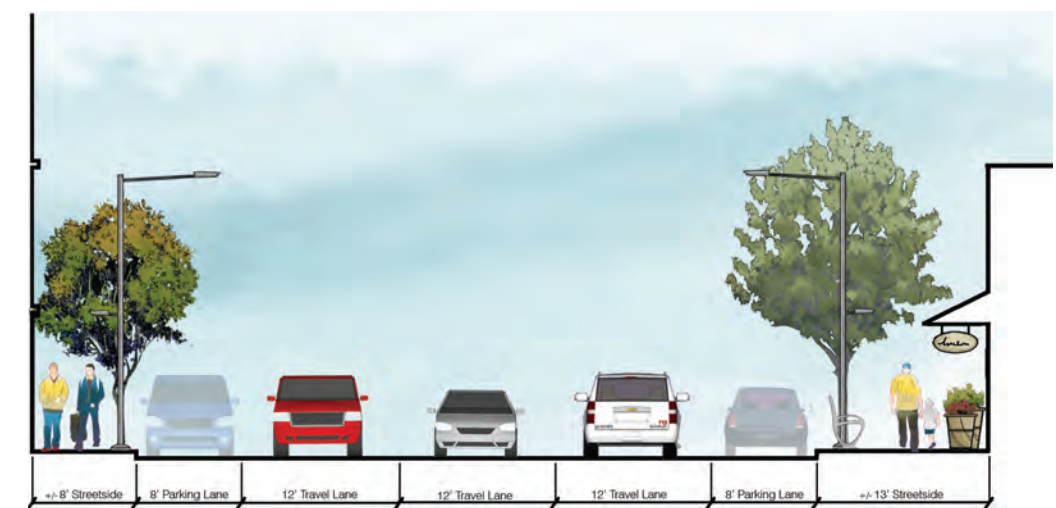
Flores Street Proposed Cross-Section, Nueva to Dolorosa
